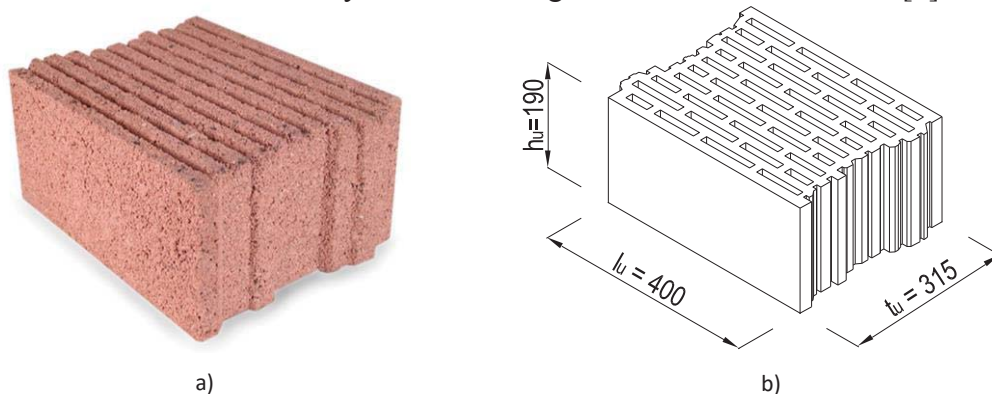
Detail of the masonry unit: a) general overview; and b) geometric details (units in millimetres).
